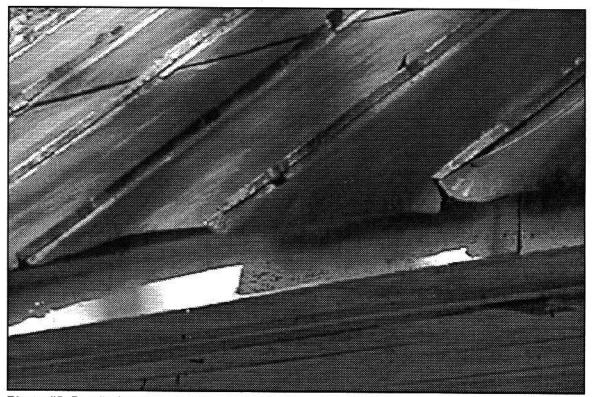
Detail of above, note seams not crimped; deteriorated condition of roofing.
